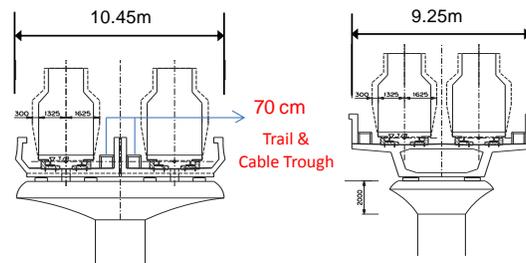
U Girder(Original) and Box Girder(Recommendation) Comparison Chart
